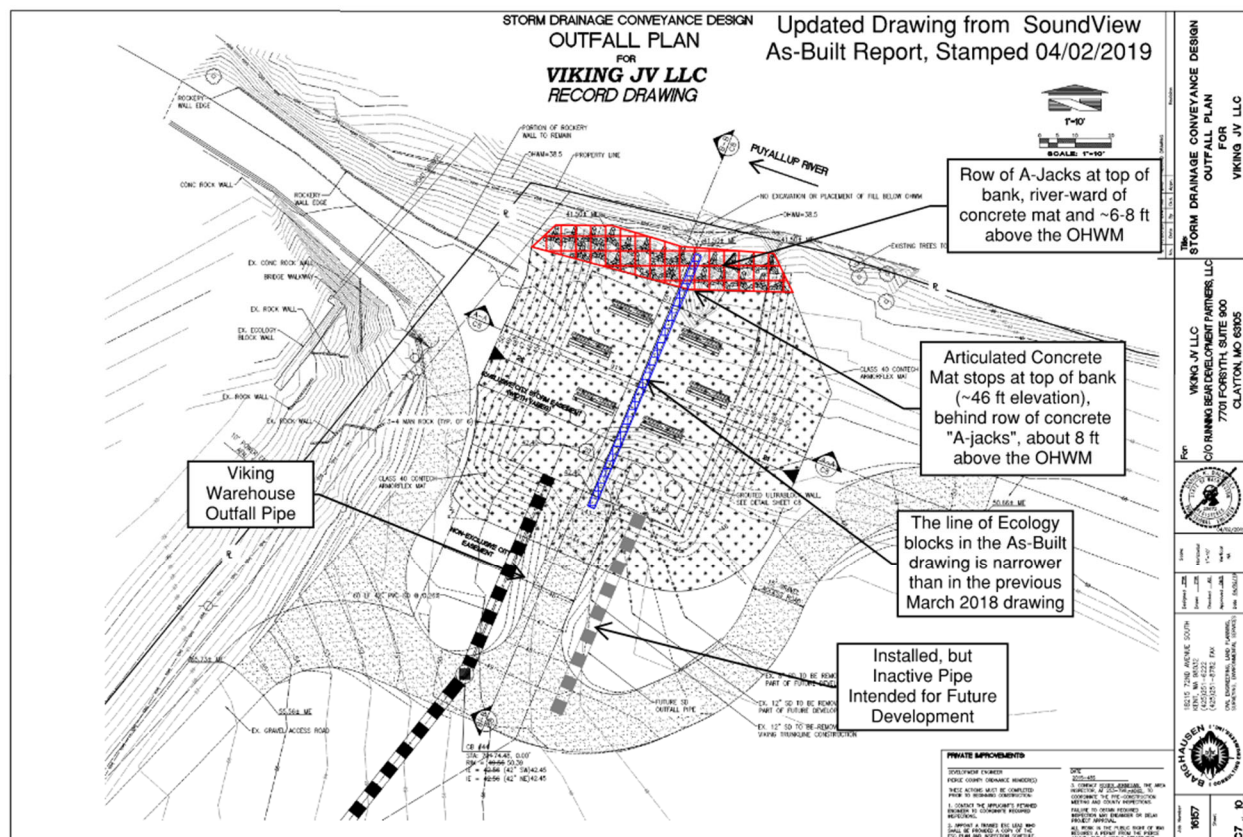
Adapted plan view of As-Built changes from the originally approved outfall structure design.
